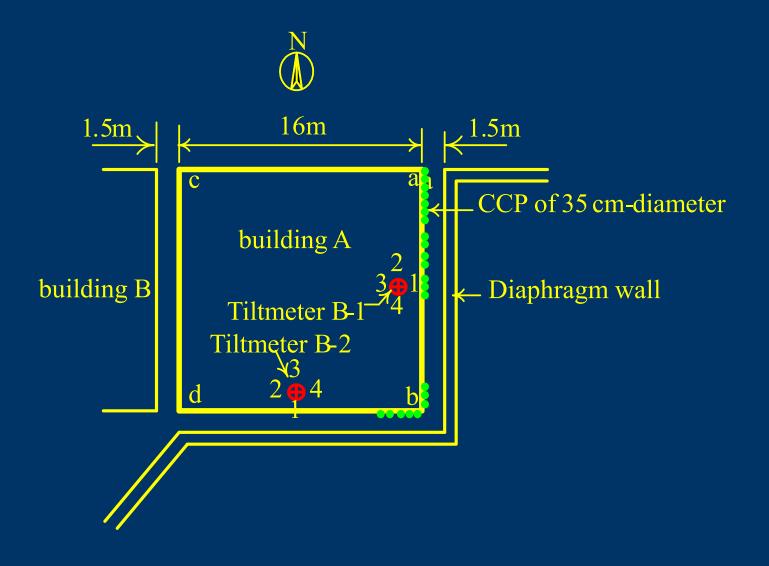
Arrangement of grouting at the building in the vicinity of the TNEC excavation (a) plan
